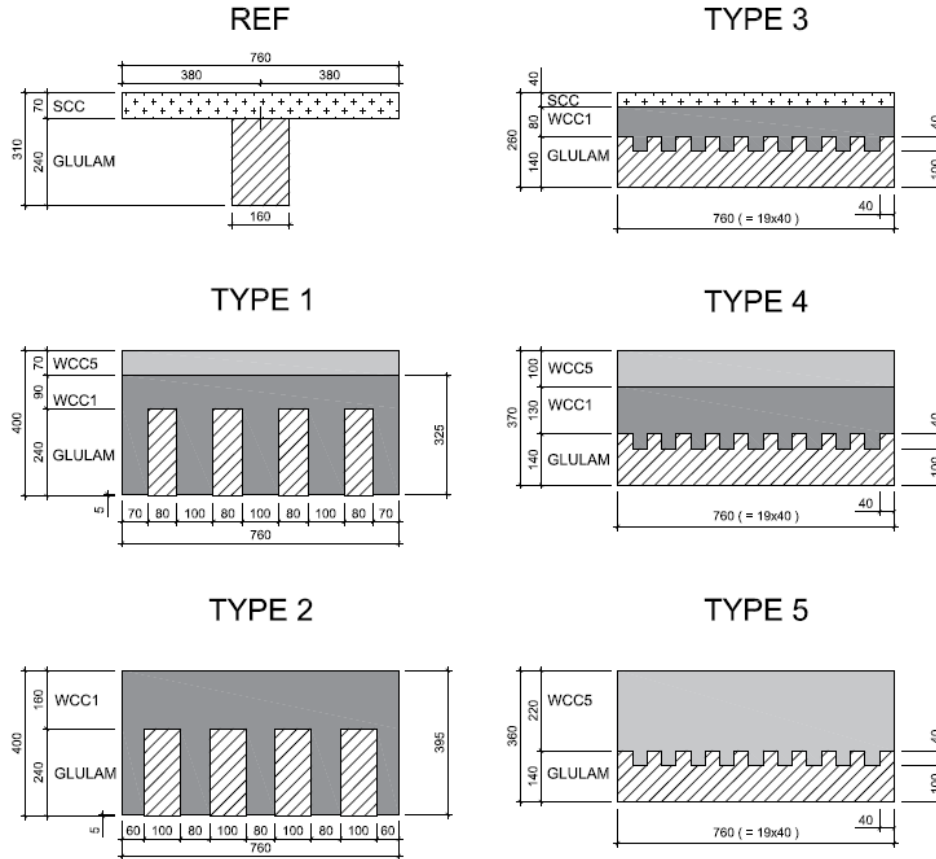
Cross-sections of the tested specimens. Dimensions in mm.
